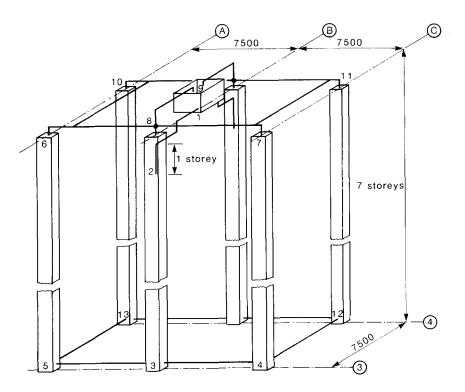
Diagrammatic arrangement of water cooling system (for one zone)
